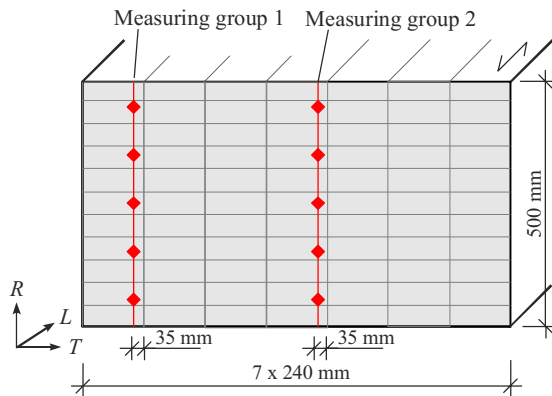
Measuring plan of bridge Horen, cross section at the support
